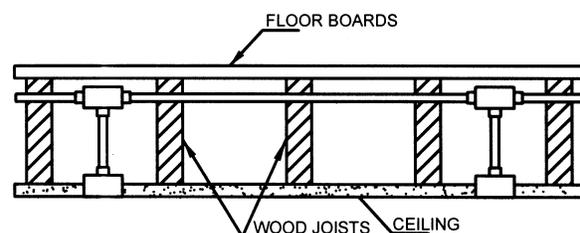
RUNNING CONDUIT IN WOOD FLOORS TO FEED LIGHTING POINTS
